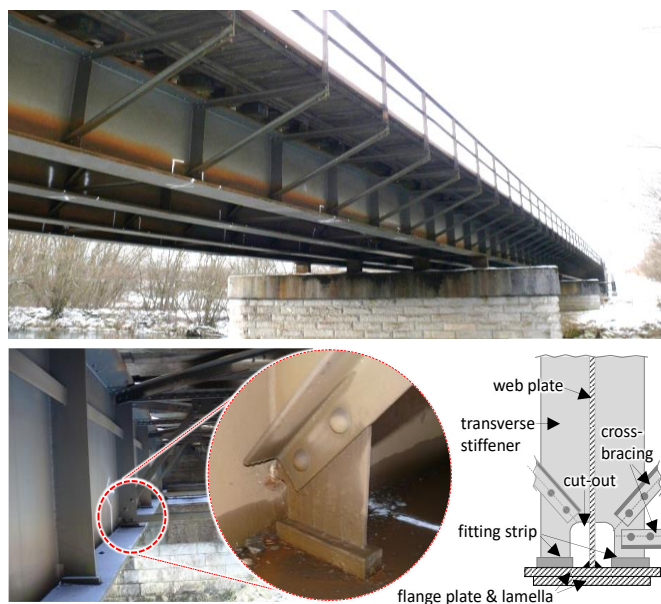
Studied railway bridge with welded main girders and specific transverse stiffener connections
